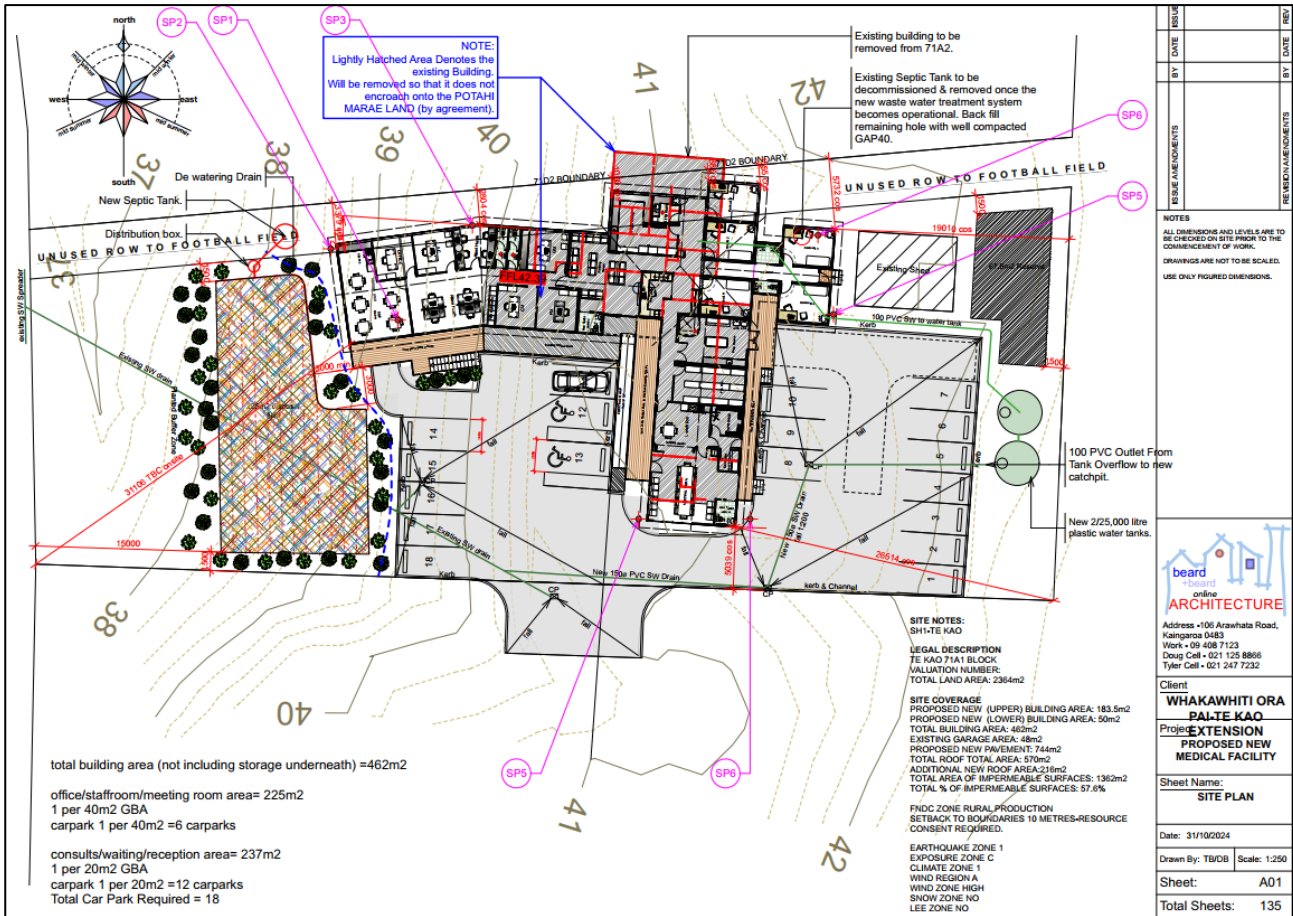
Snip of Proposed Site Plan Provided by Beard & Beard Online Architecture (dated: 31.10.2024)
